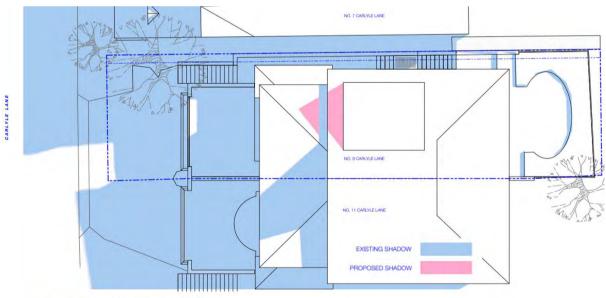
Shadow Diagram at 9.00am in mid-winter (June 21) detailing shadow cast from the dormer affecting the roof of the existing semi-detached dwelling (SDP-04 Rev A)
